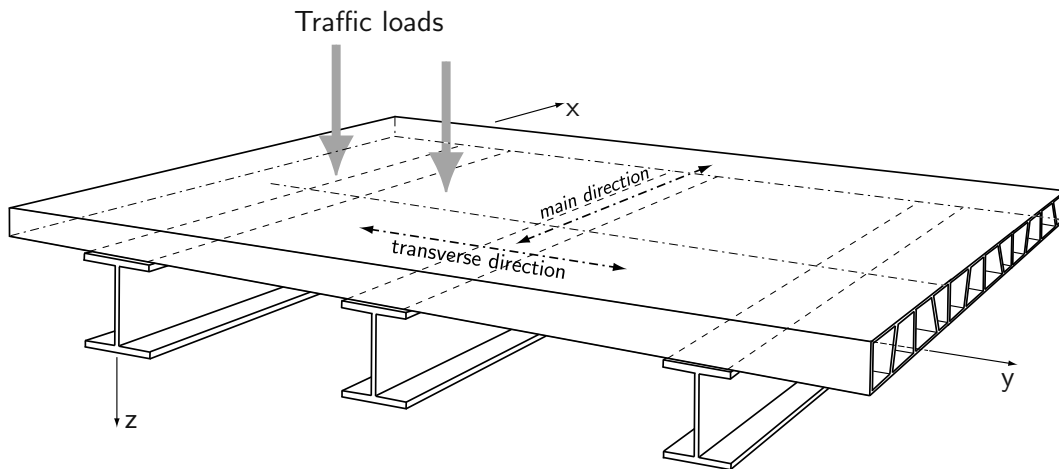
Basic diagram of a pultruded FRP bridge deck adhesively bonded to steel girders
